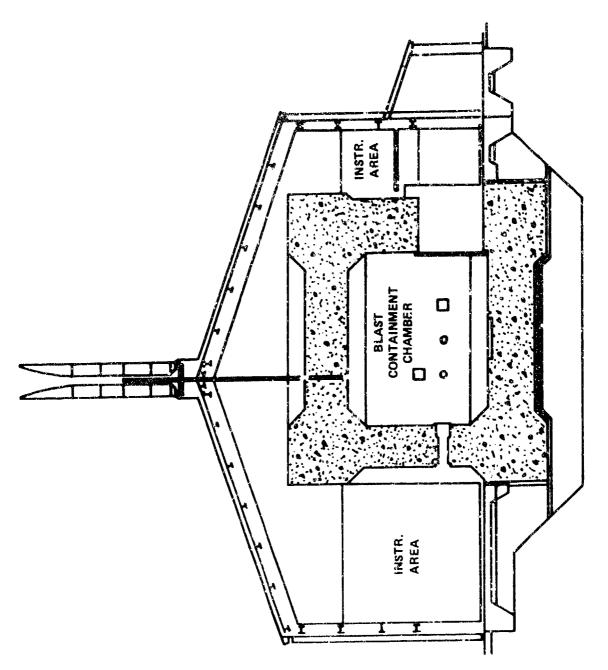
BUILDING 327, SIDE VIEW, NORTH
